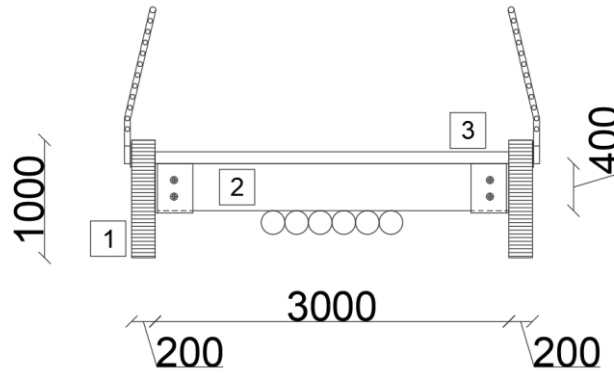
Deck Proposed Section with Structural Element Dimensions²³
